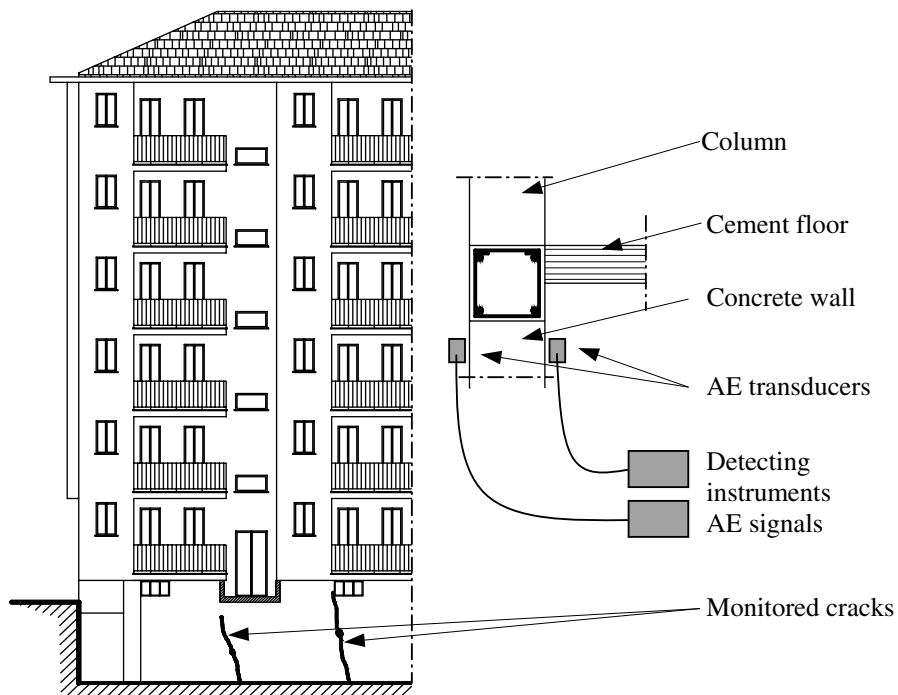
Building in Cascine Vica. Cracking framework and location of transducers on the concrete wall.
